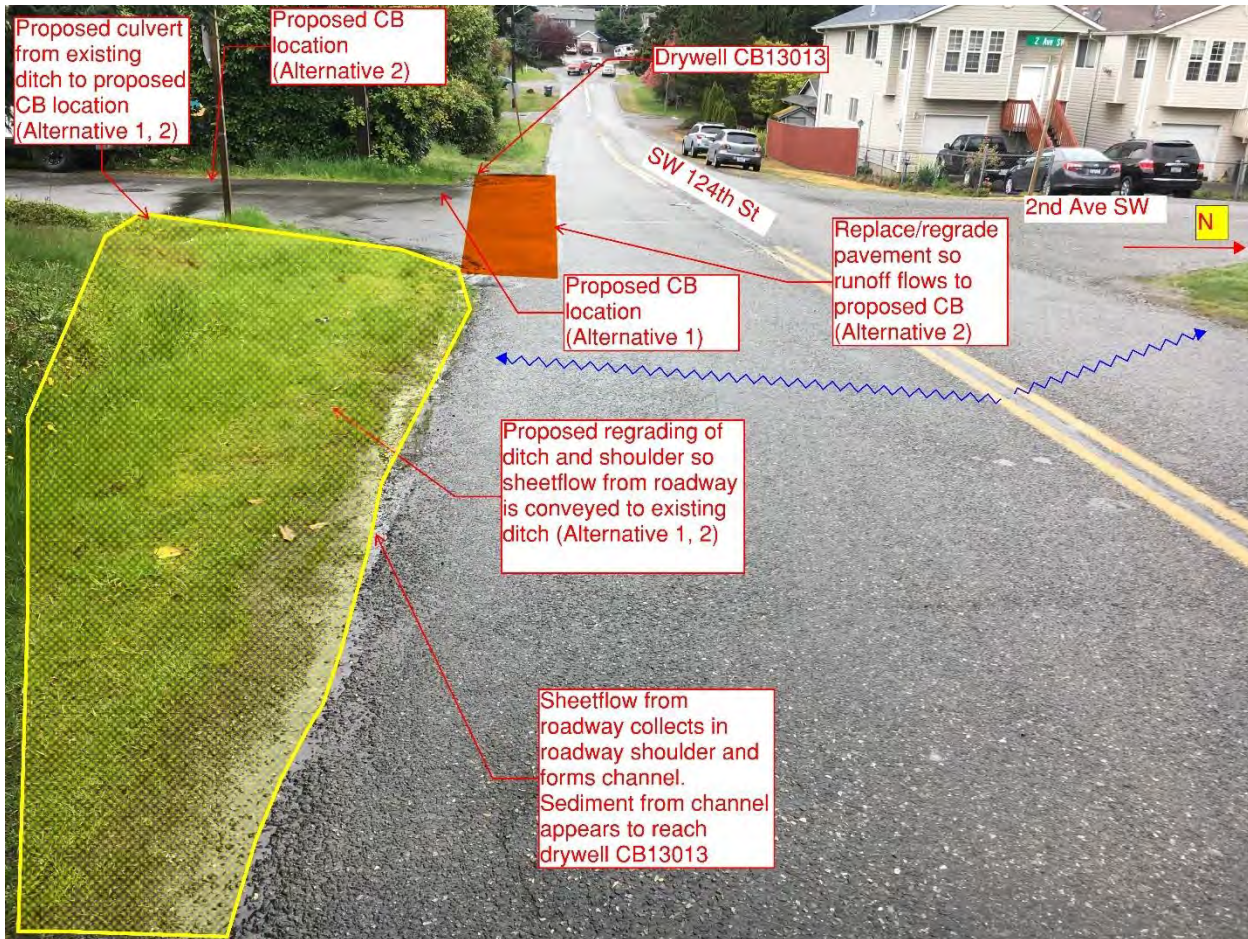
Current conditions and proposed improvements upstream of CB13013. Photo date 4/19/2019, photo taken facing west
